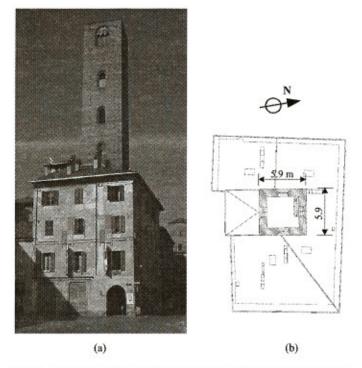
Torre Sineo: (a) elevation of the tower; (b) plan of the tower and the building it is embedded in
